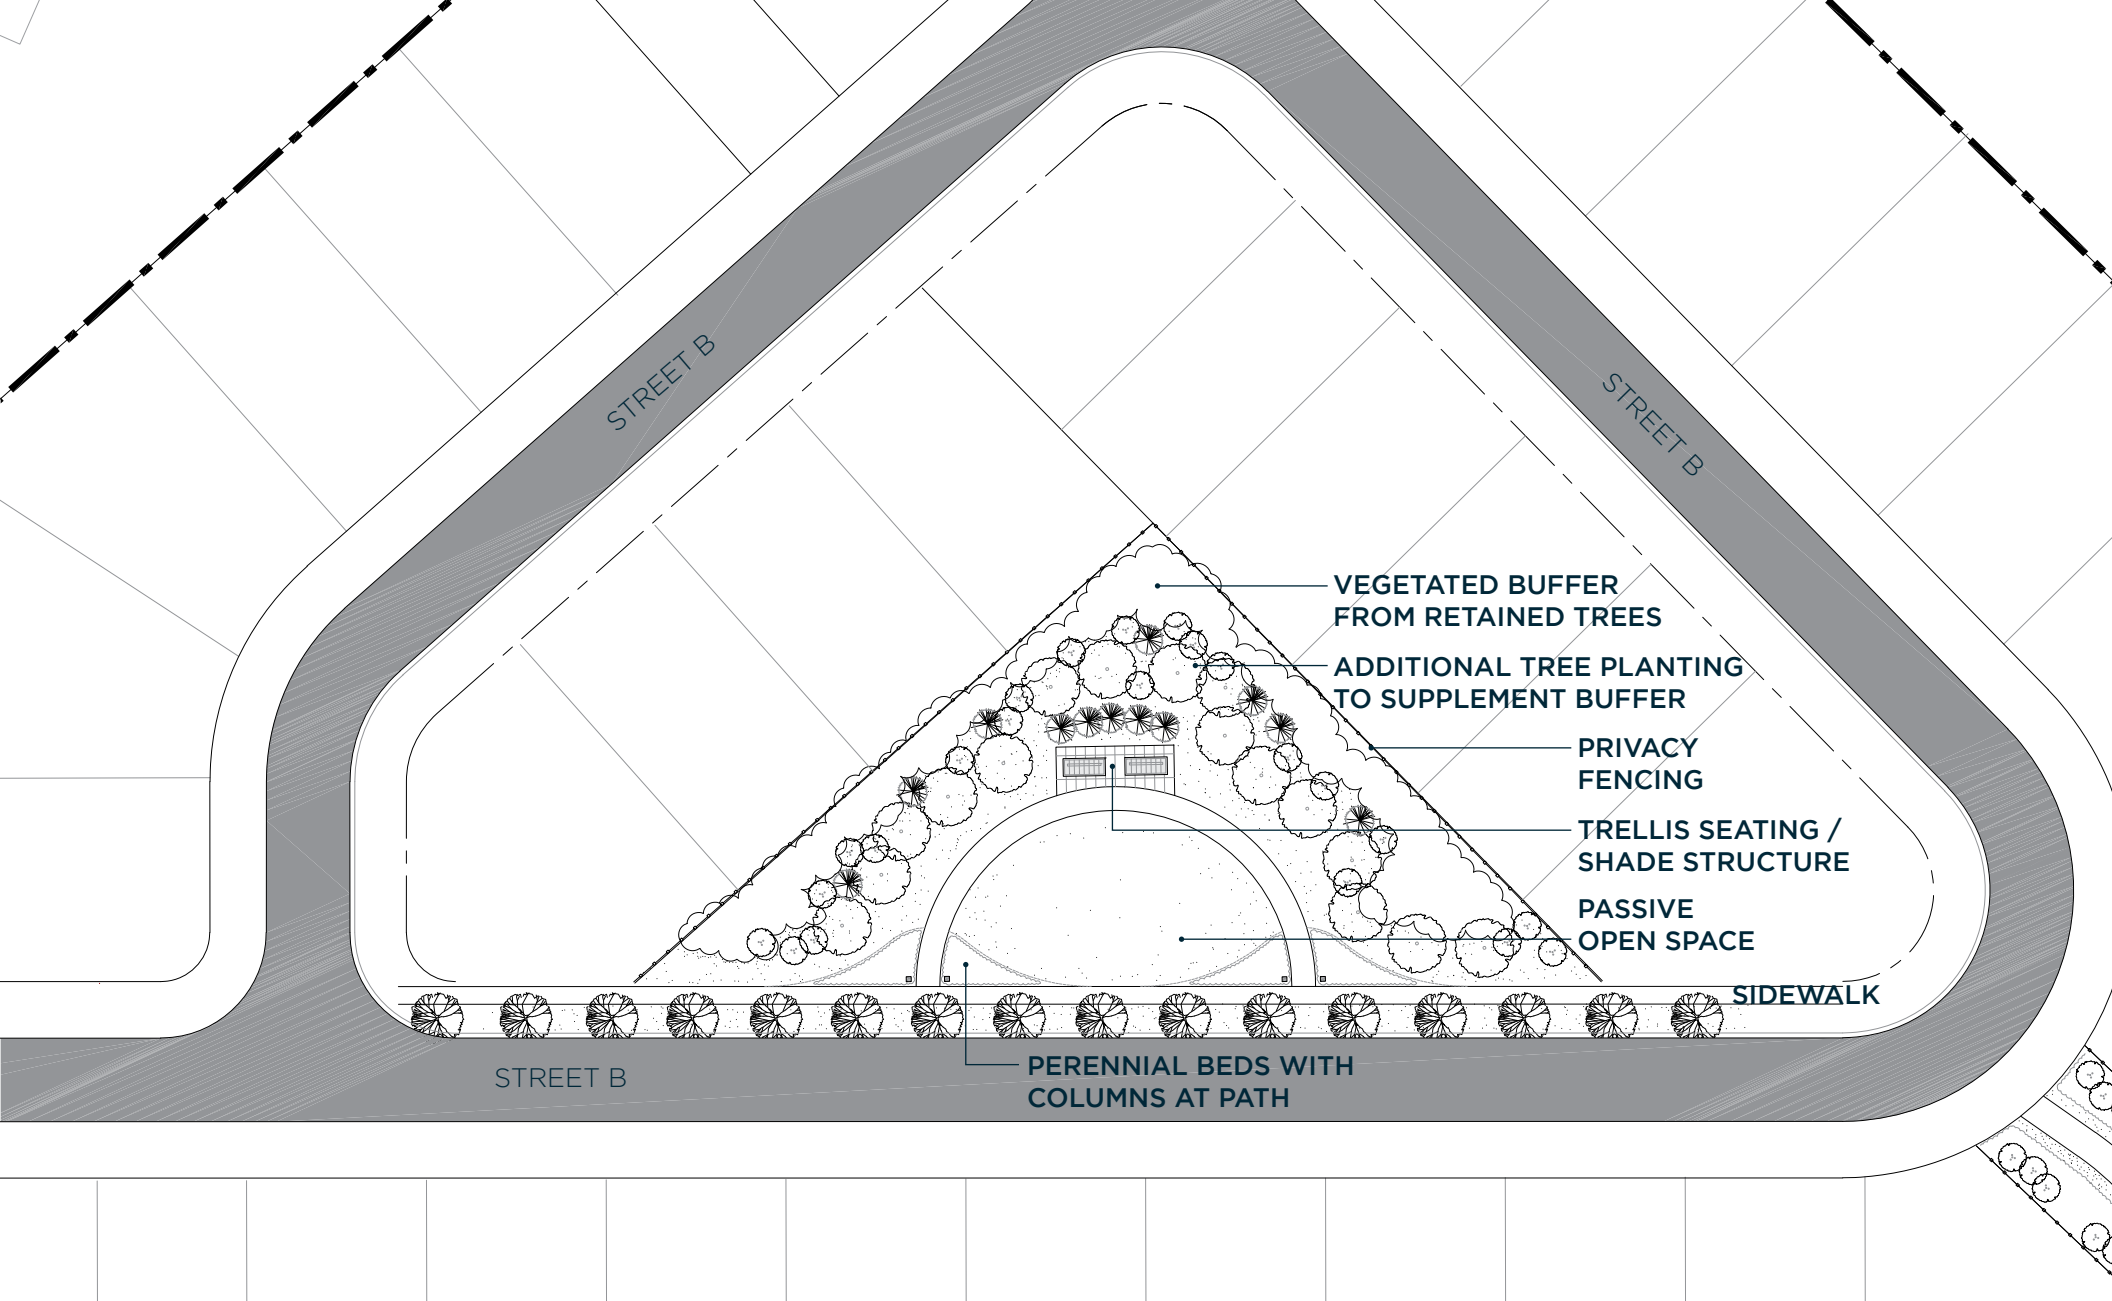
Conceptual Parkette Facility Fit Plan (0.23 ha.)
